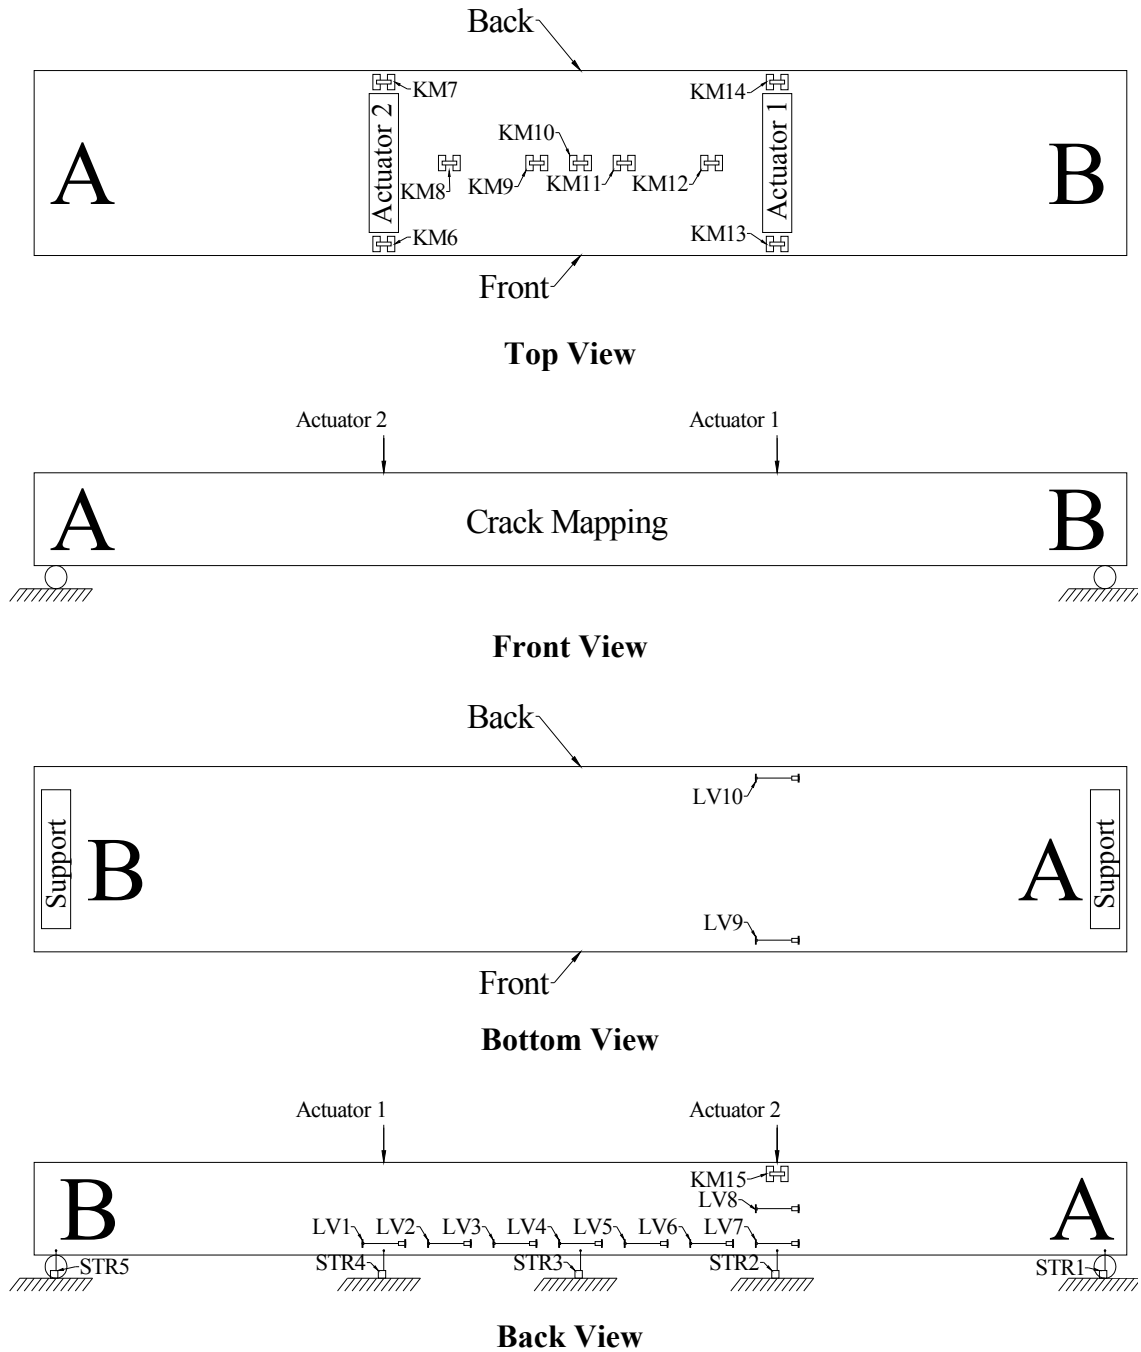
External Instrumentation Layout for the Four-Point Tests except for LSC16.
